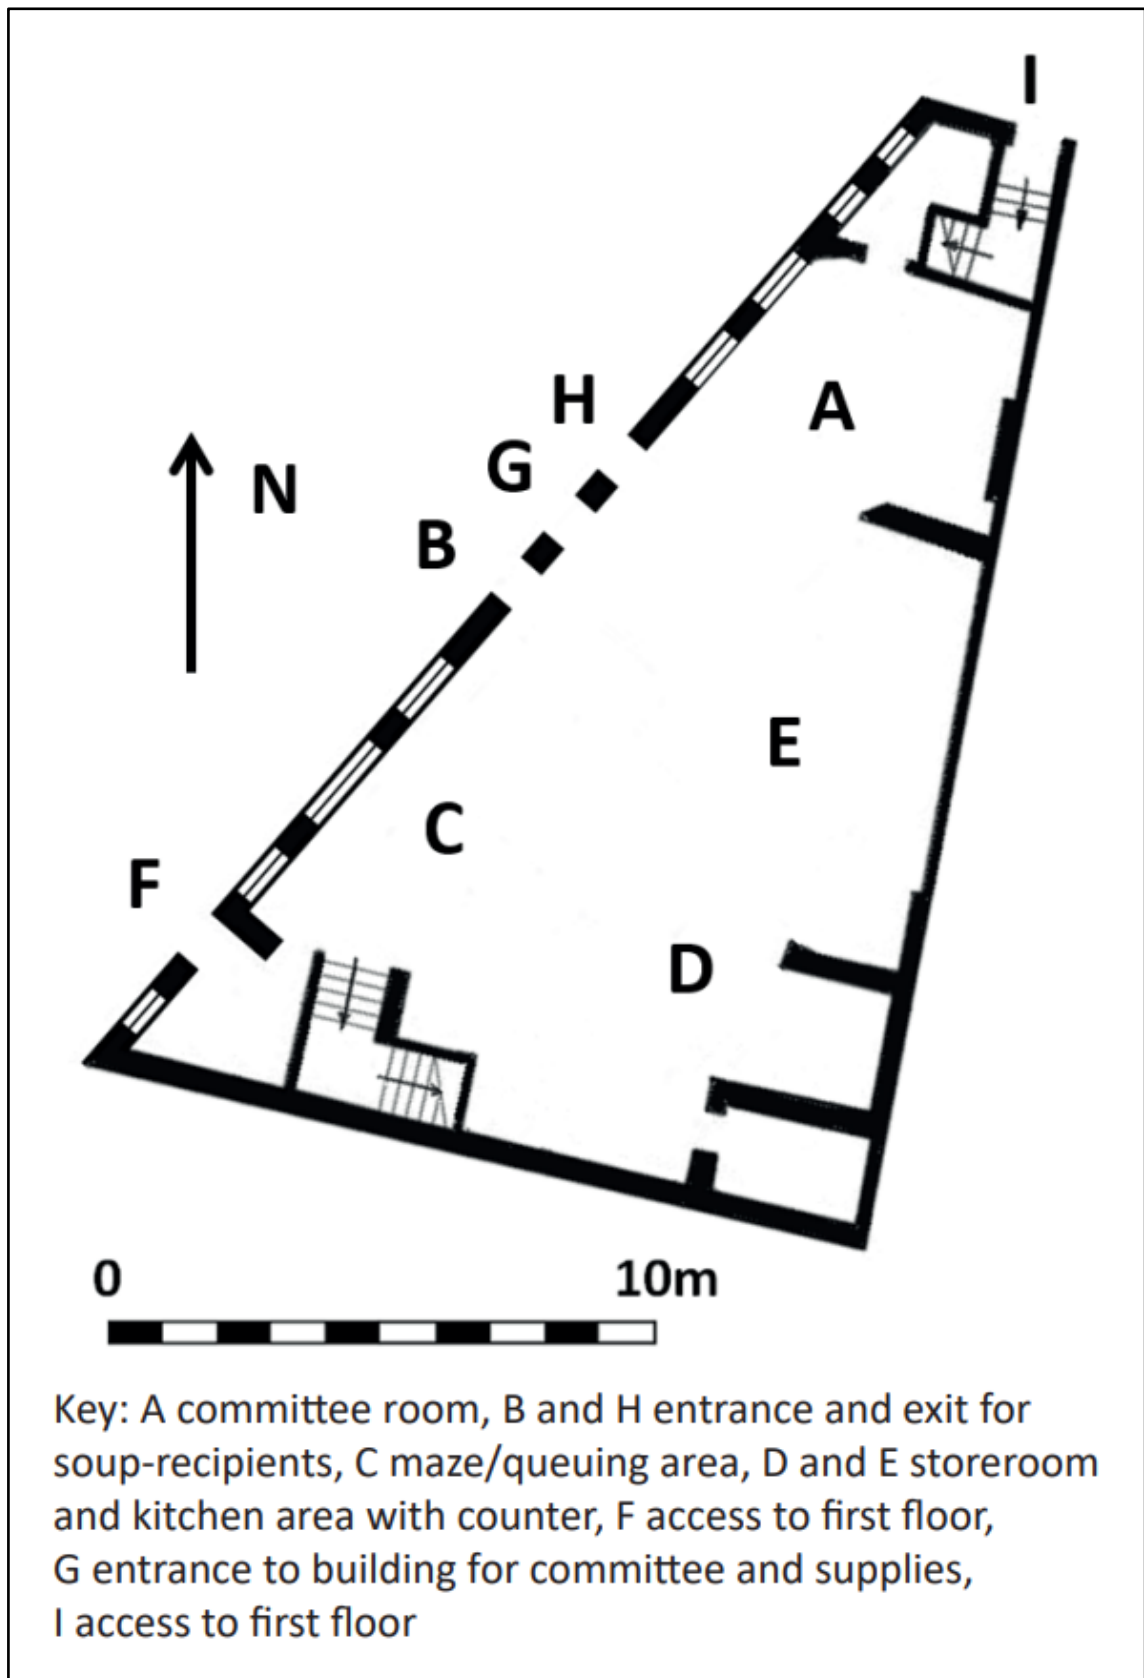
Conjectural plan of Manchester Philanthropic Hall ground floor; (plan based on author's survey of exterior and Manchester 2011).
